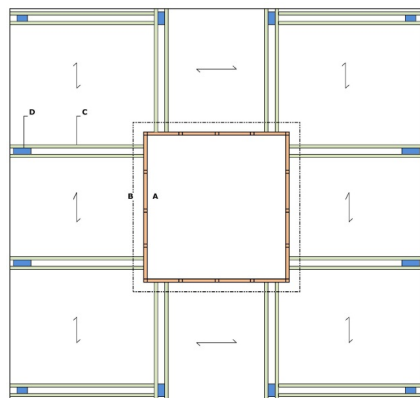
Plan of structure, A – IPC (integrated panel core), B - 'hoop' beam at each floor level, C – engineered timber floor beam, D – engineered timber column. arrows indicate floor joist span
